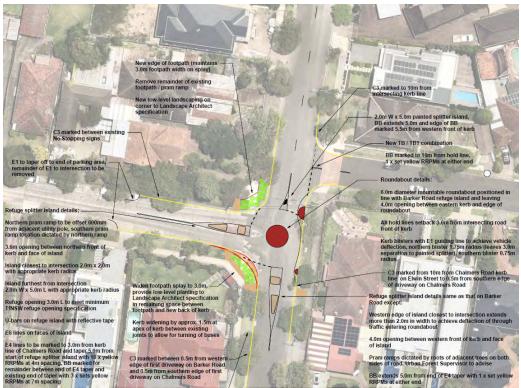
proposed roundabout at the intersection of Barker Road and Chalmers Road
